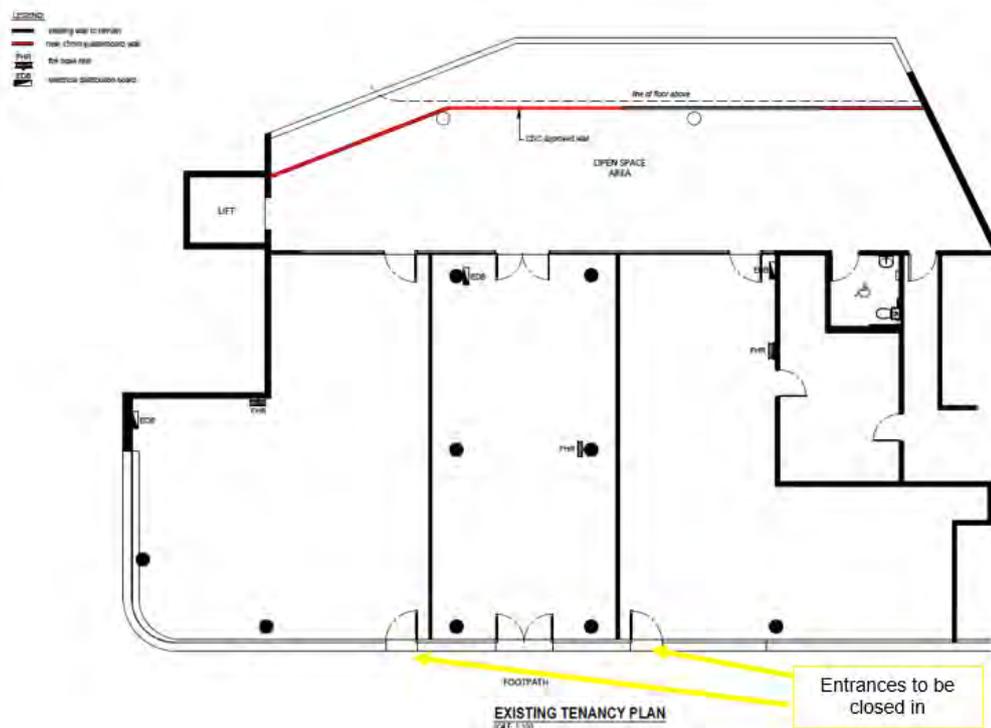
Existing tenancy plan (location of entrances to be removed shown in yellow)
